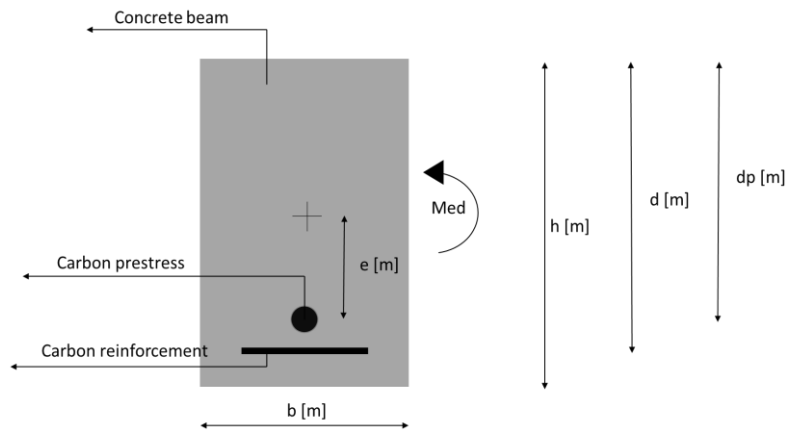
Prestressed RC beam - CFRP rebar and carbon tendons
